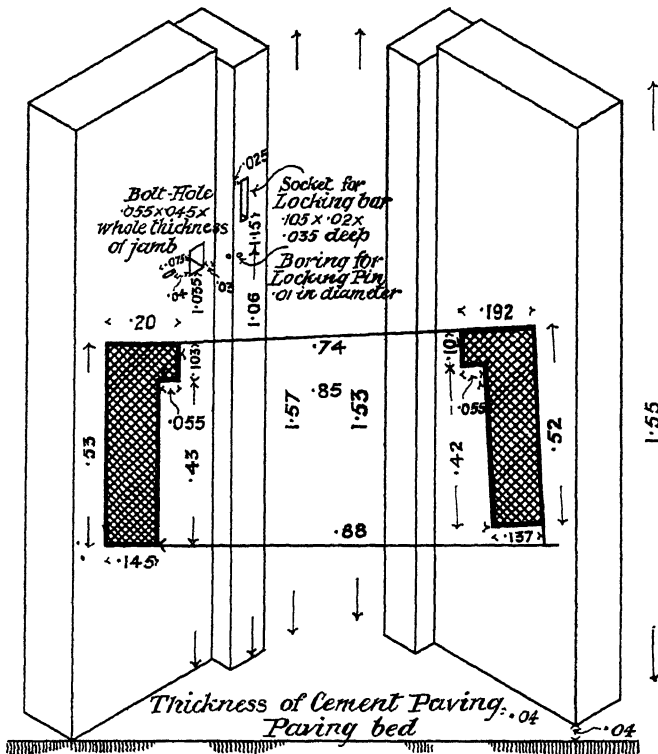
PLAN AND ISOMETRICAL SKETCH OF GYPSUM JAMBS, SHOWING HOLES FOR BOLTS AND LOCK. ($\frac{1}{20}$.) (BY CHRISTIAN C. T. DOLL.)
